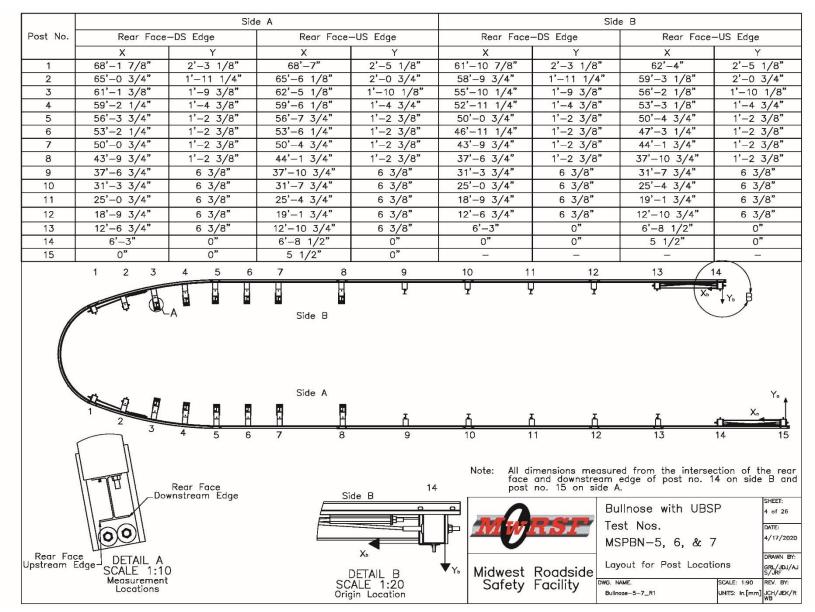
Layout for Post Locations, Test Nos. MSPBN-5 through MSPBN-7
